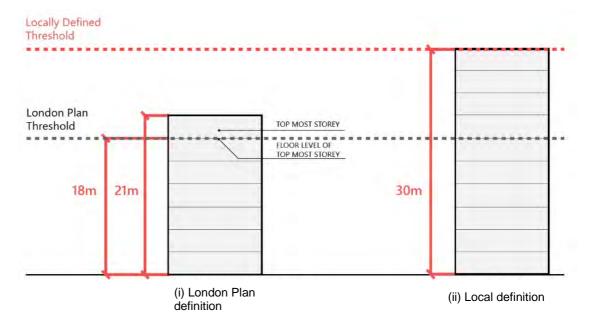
Definitions for tall buildings (we have assumed 3m floor to ceiling heights)
